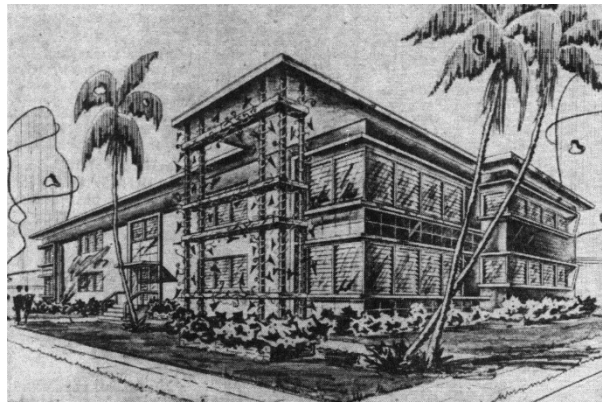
Rendering of apartment building on 40th Street, Miami Beach, 1950.
